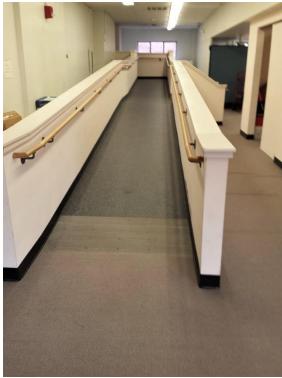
Interior ramp connecting 18 and 20 Trinity Street.
